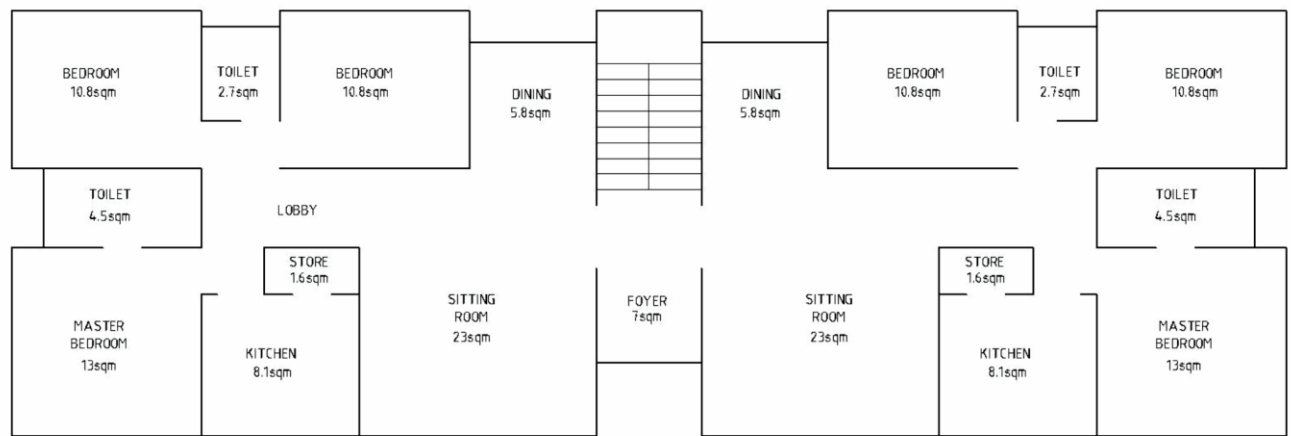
Sketch of a typical Floor Plan of a twin 3-bedroom flat in the medium density area of Ikeja
